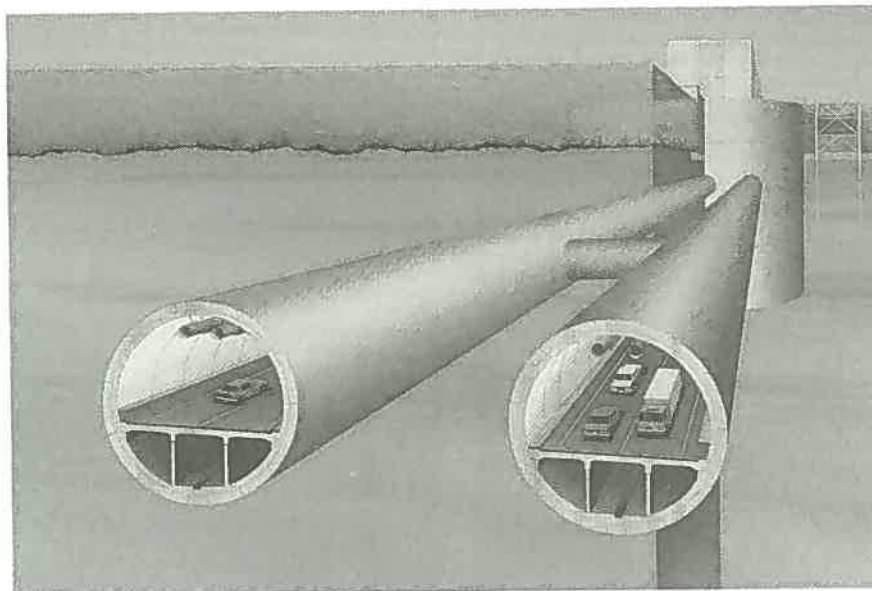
Planning tunnels of the Trans-Tokyo Bay Highway
